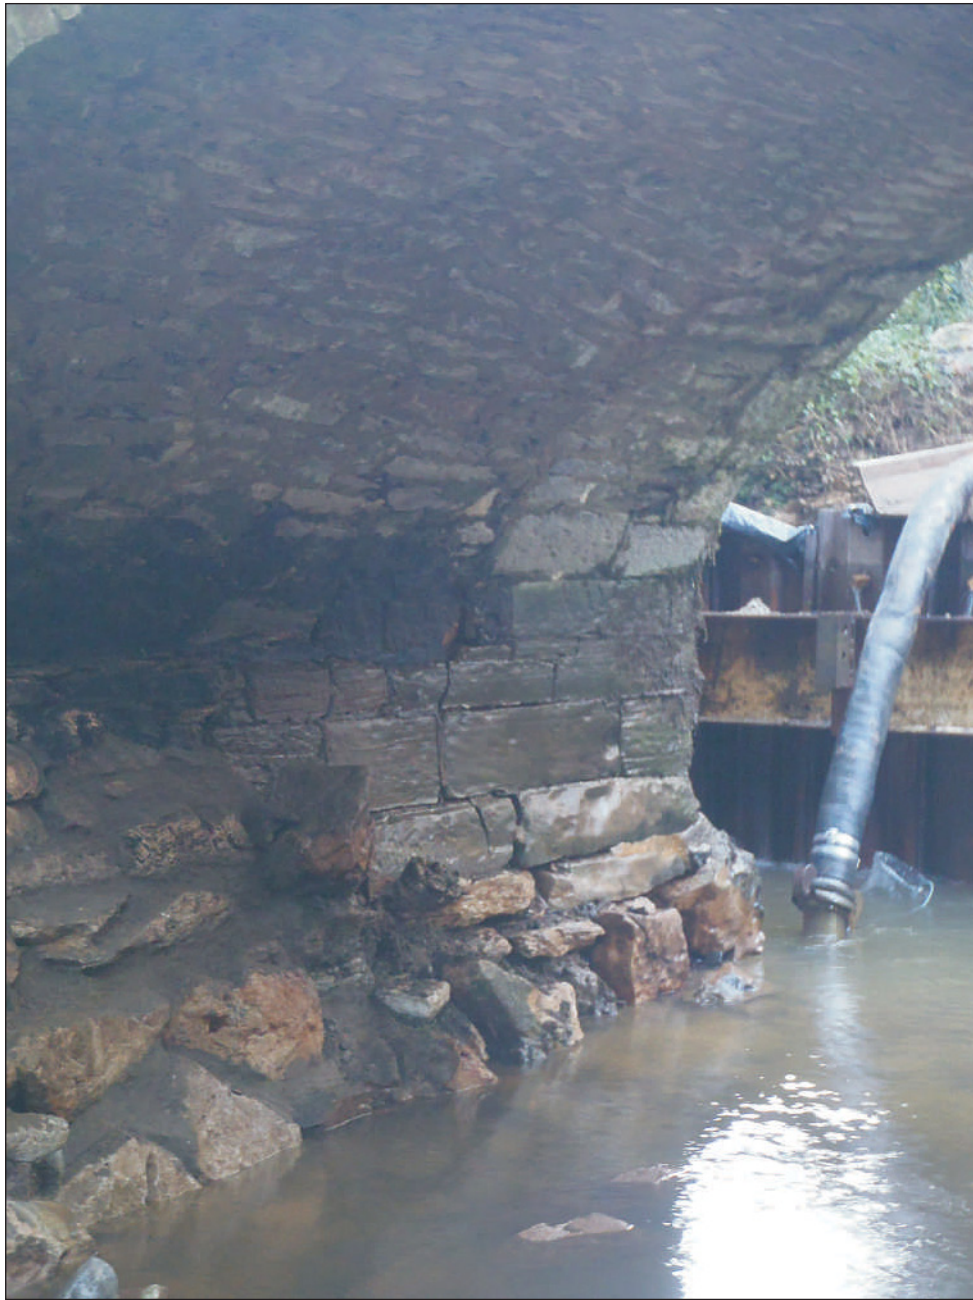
The northern arch, showing the rebuilt east face, viewed from the southeast.
